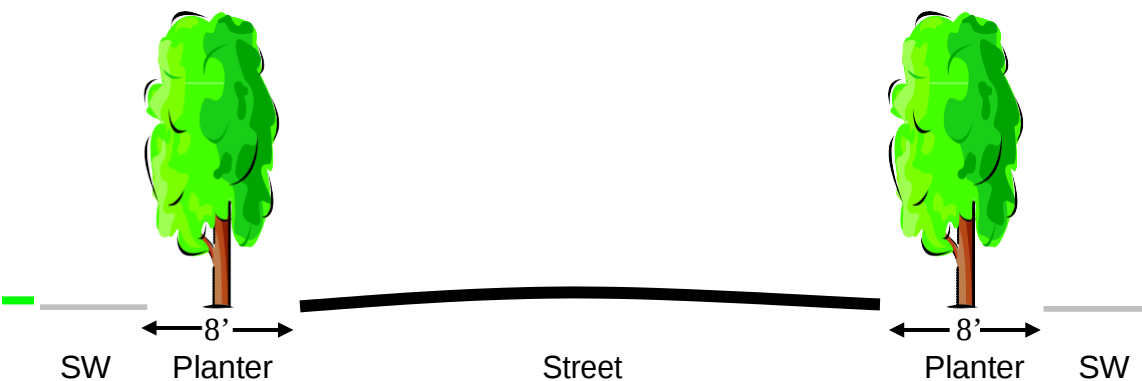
When space does not allow development of a full median, providing 8' planter strips will allow development of large, canopy forming trees. Planter strips should not be less than 6' wide. These narrow widths will only allow planting of small to medium sized trees that will not produce the canopy effect.
